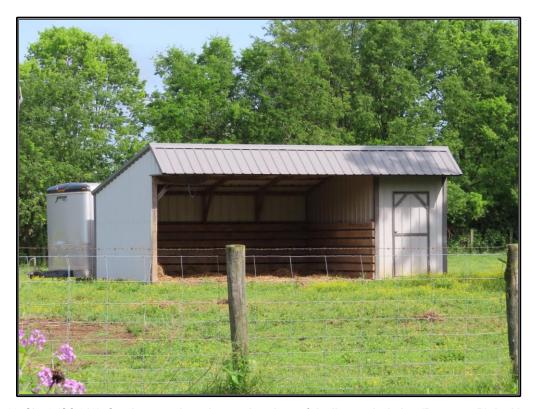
Site 2 (SC 813): Southeast and southwest elevations of the livestock shelter (Resource B), looking north.
